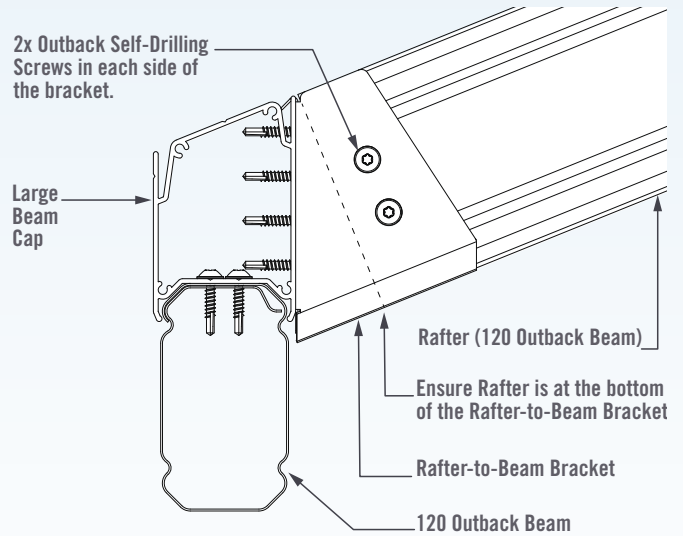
LARGE BEAM CAP - 120 SIDE BEAM - 120 RAFTER
